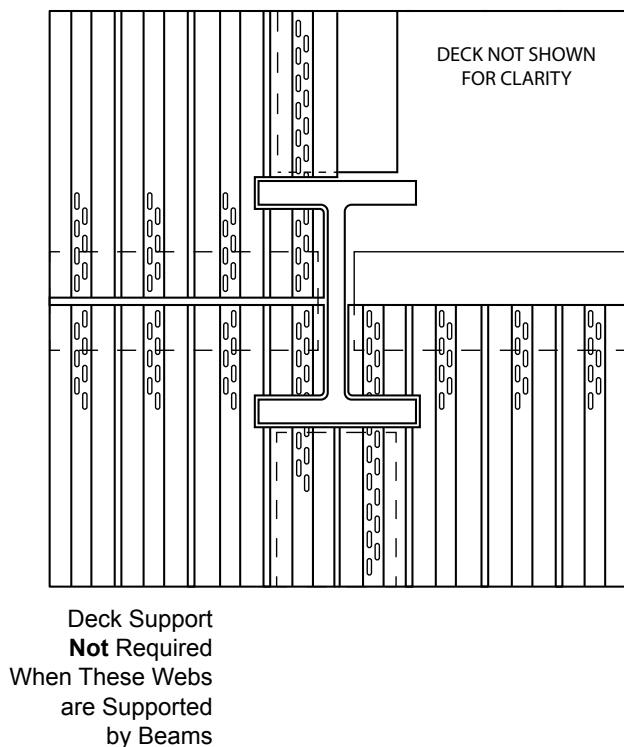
COLUMN DETAIL NOT REQUIRING DECK SUPPORT ANGLES
